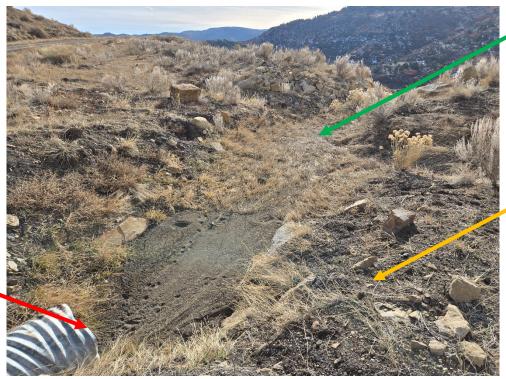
Looking southeast at the outlet for C4 (red arrow). The yellow arrow indicates the termination of Ditch D71. The green arrow indicates the beginning of D72.
